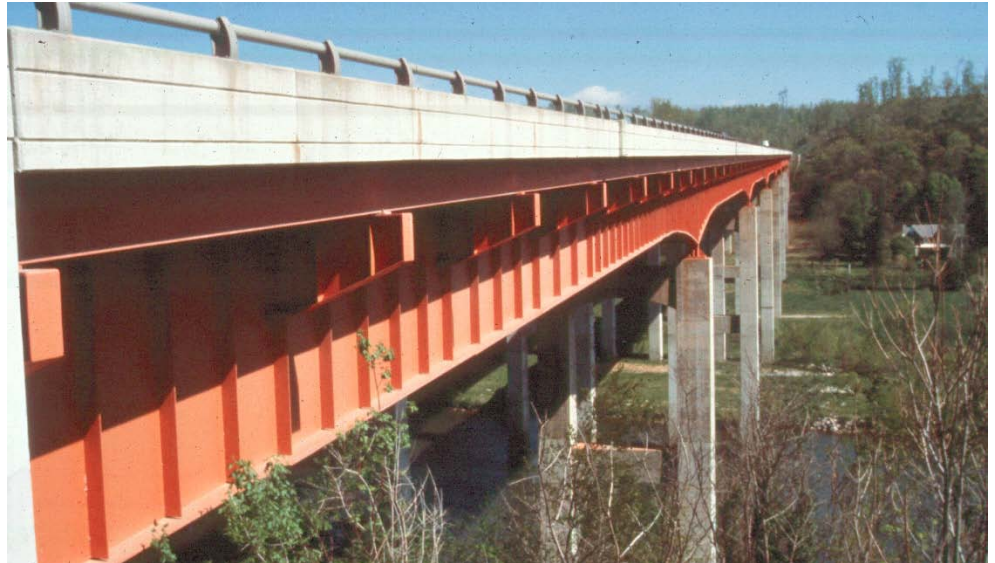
Flexural Zone on a Two-Girder Bridge
